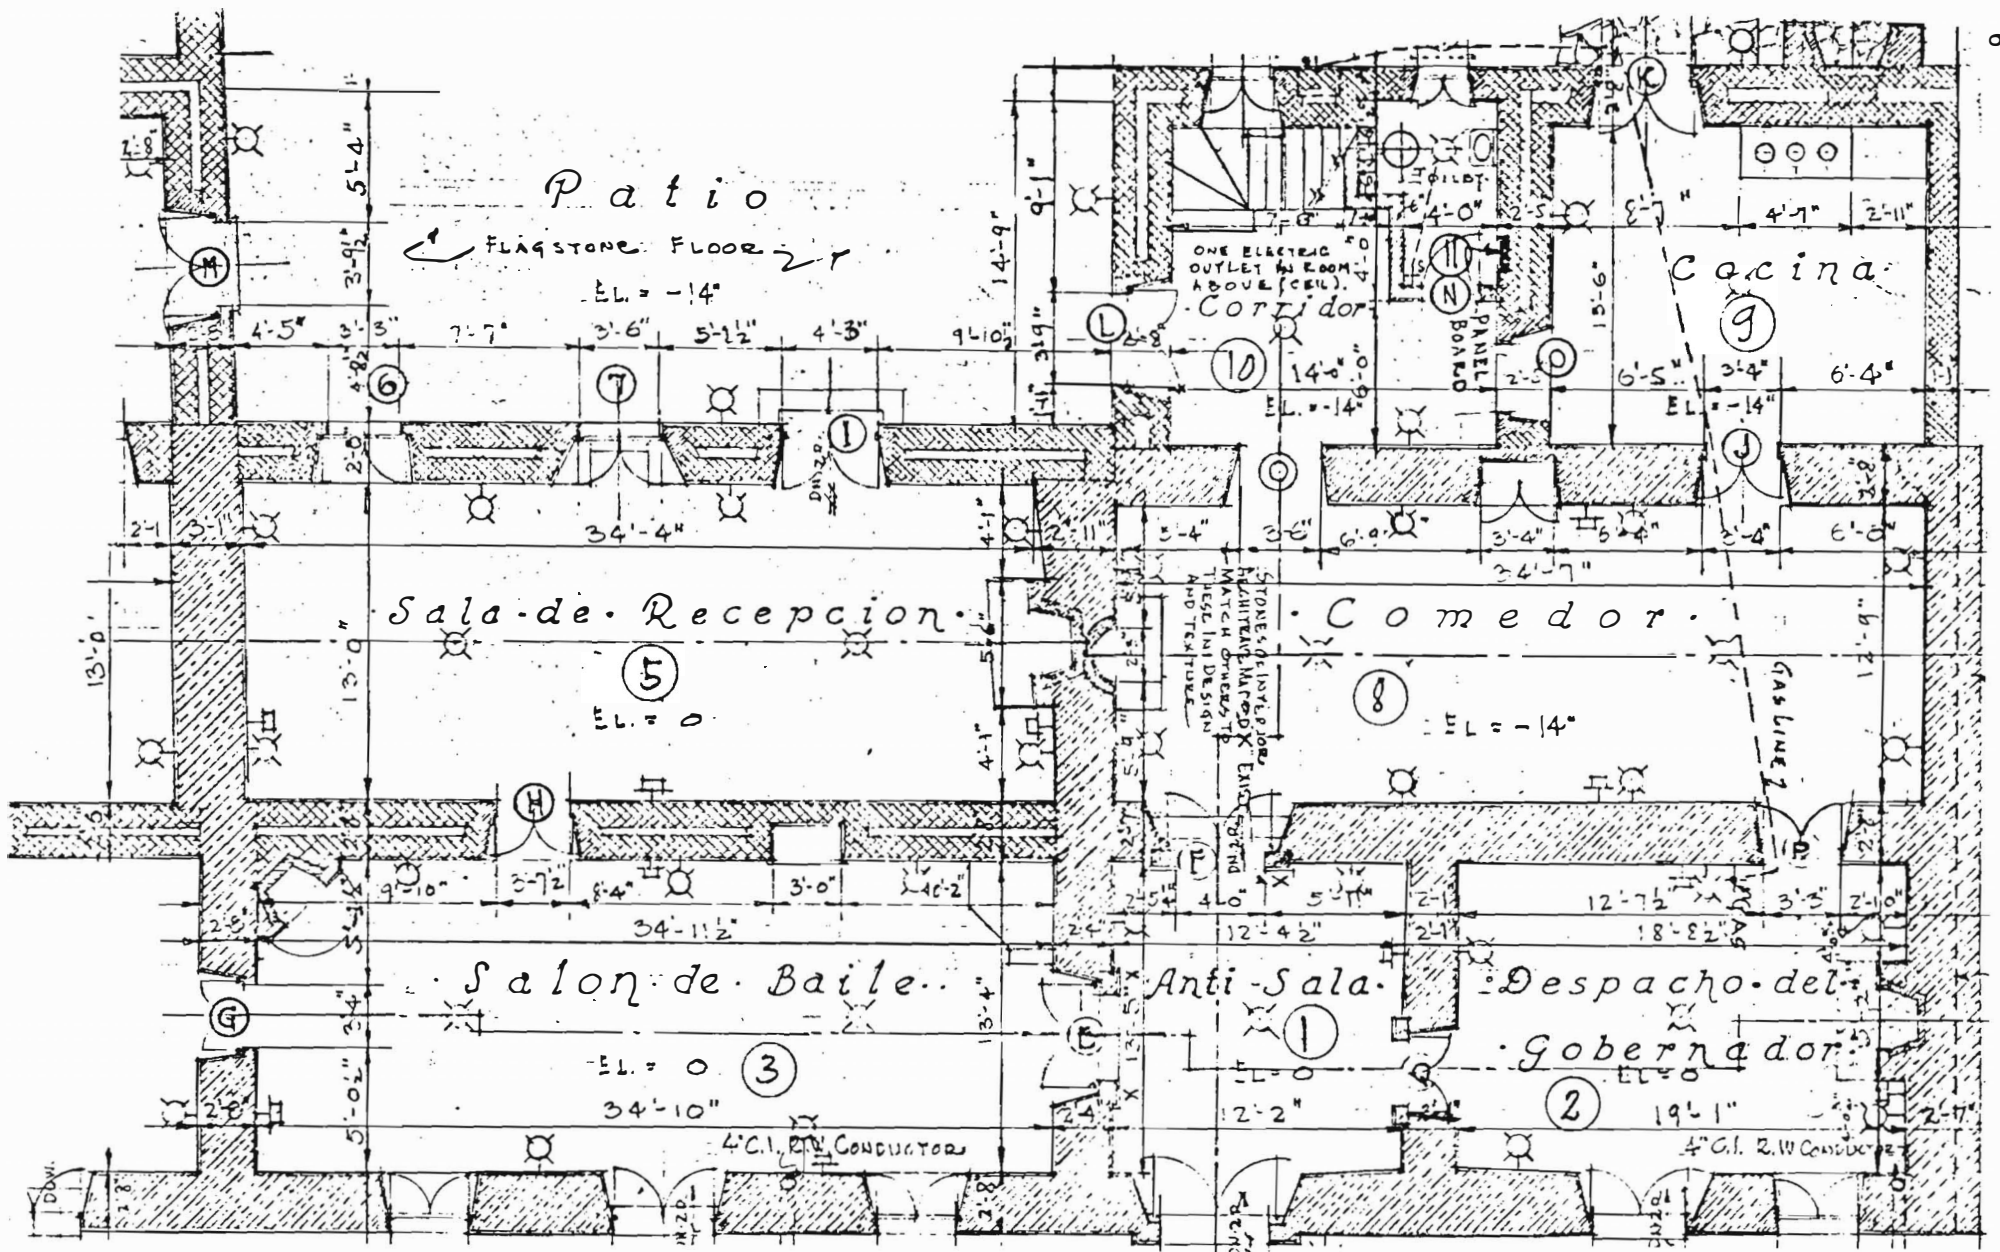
Reconstruction Plan for the Spanish Governor's Palace showing rooms and major architectural features. (Detail adapted from Sheet 3, Restoration Drawings by Harvey P. Smith, Sr.)
